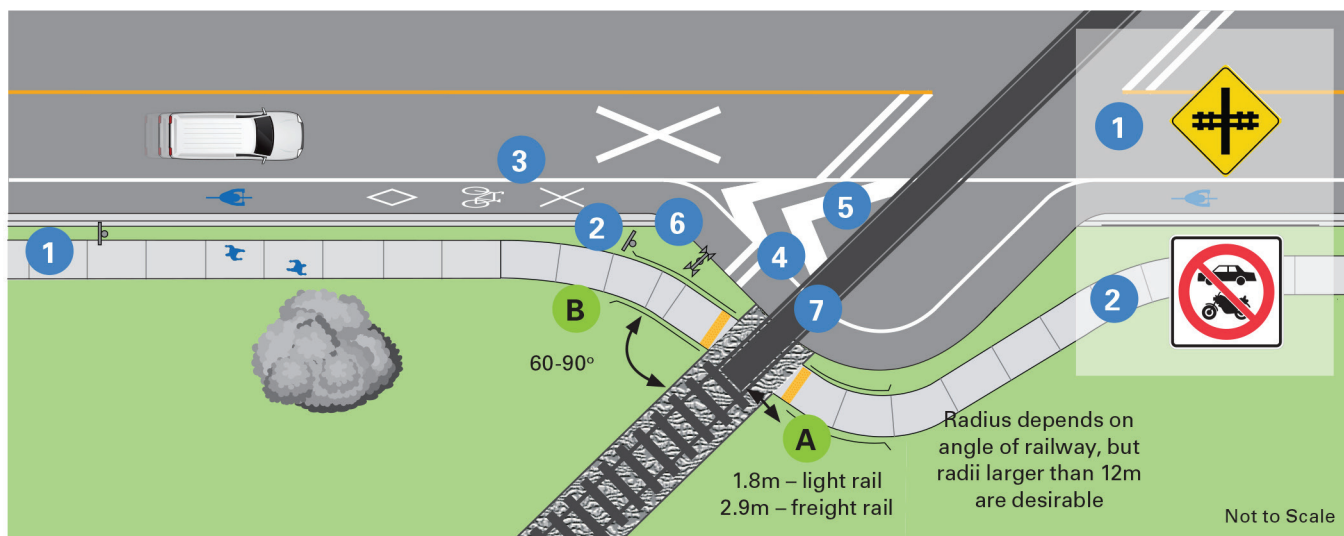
Jughandle Design for a Dedicated Bikeway with Sidewalk
